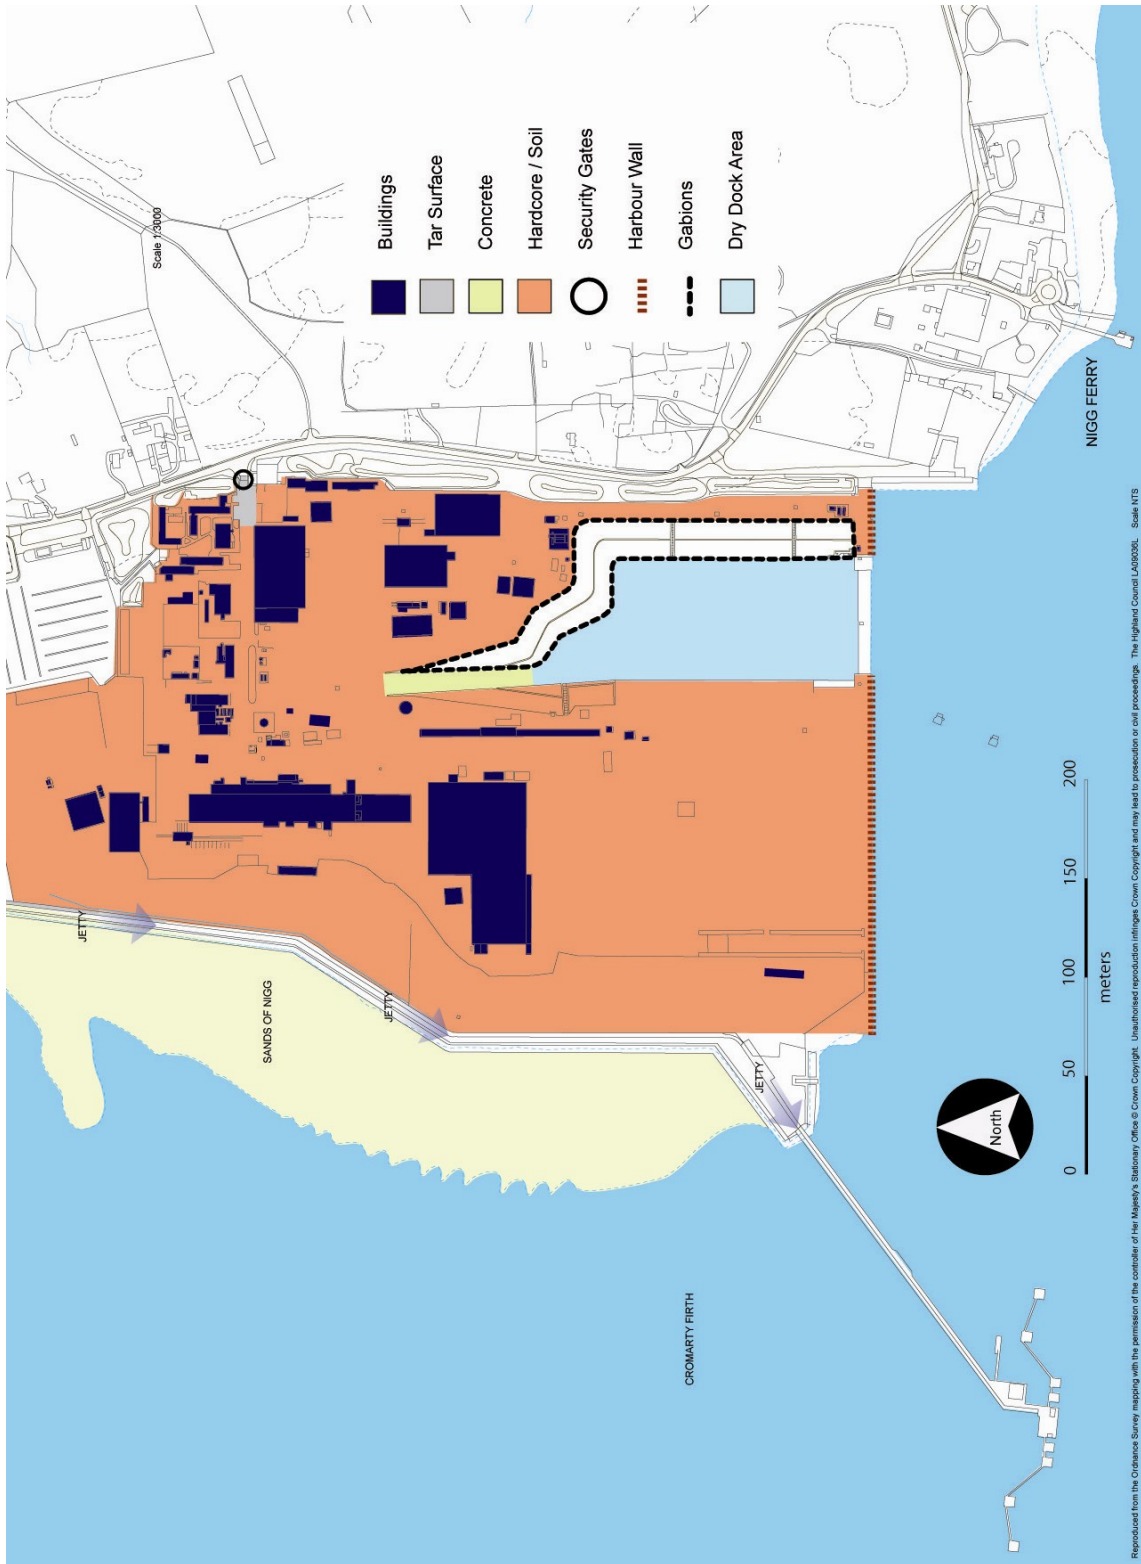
Fabrication Yard – Existing Yard Buildings
